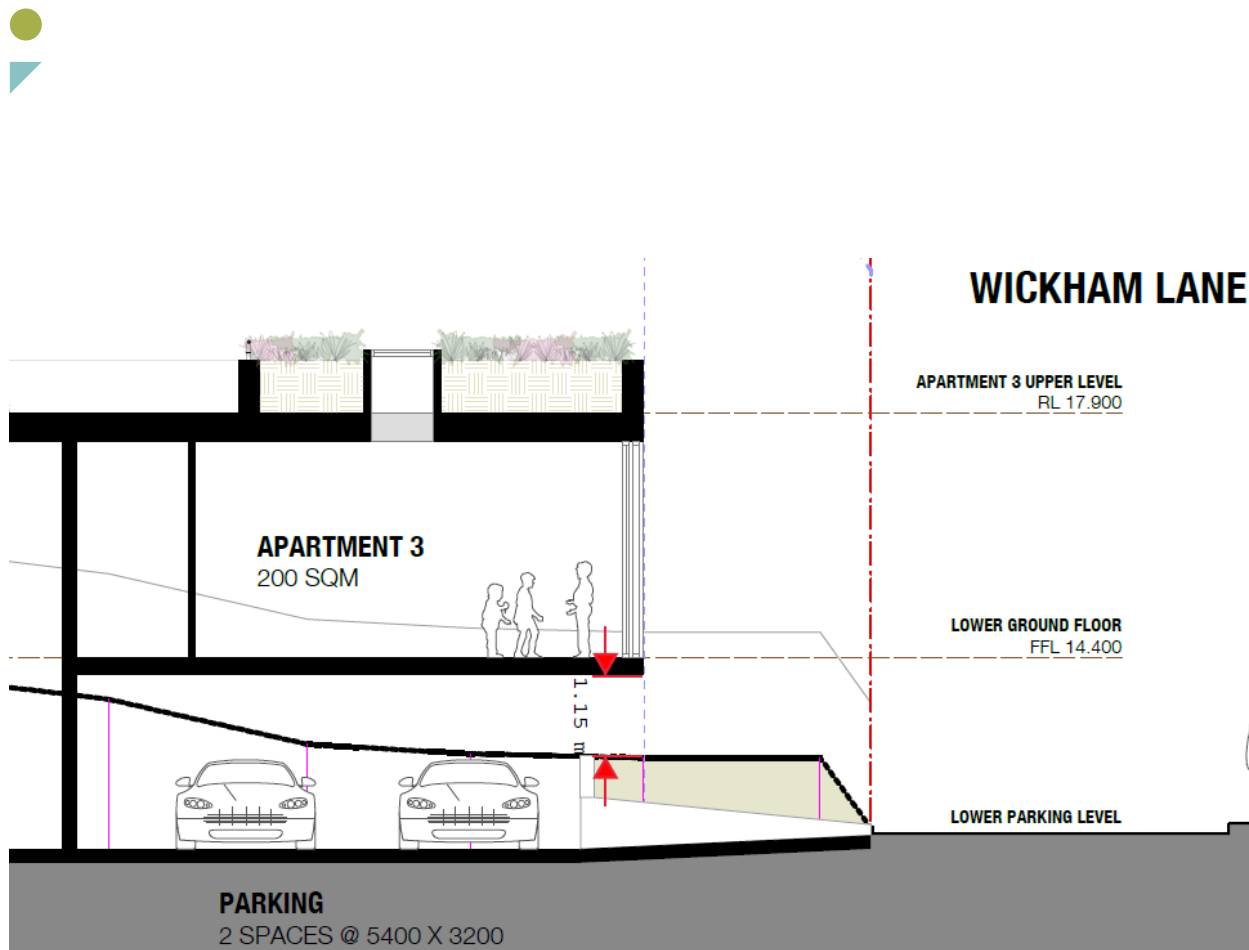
Proposed section through eastern building showing the height of the rear car parking area above existing ground level
